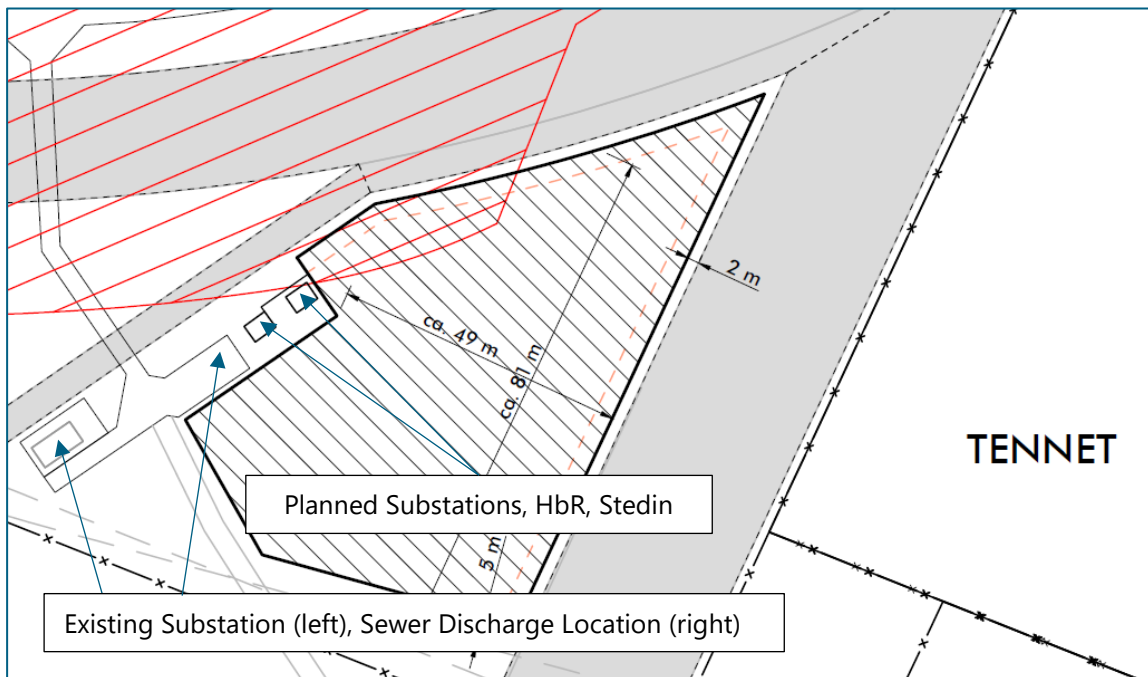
Existing and Planned Substations next to Porthos Onshore Plot Plan (Ref. [23])
